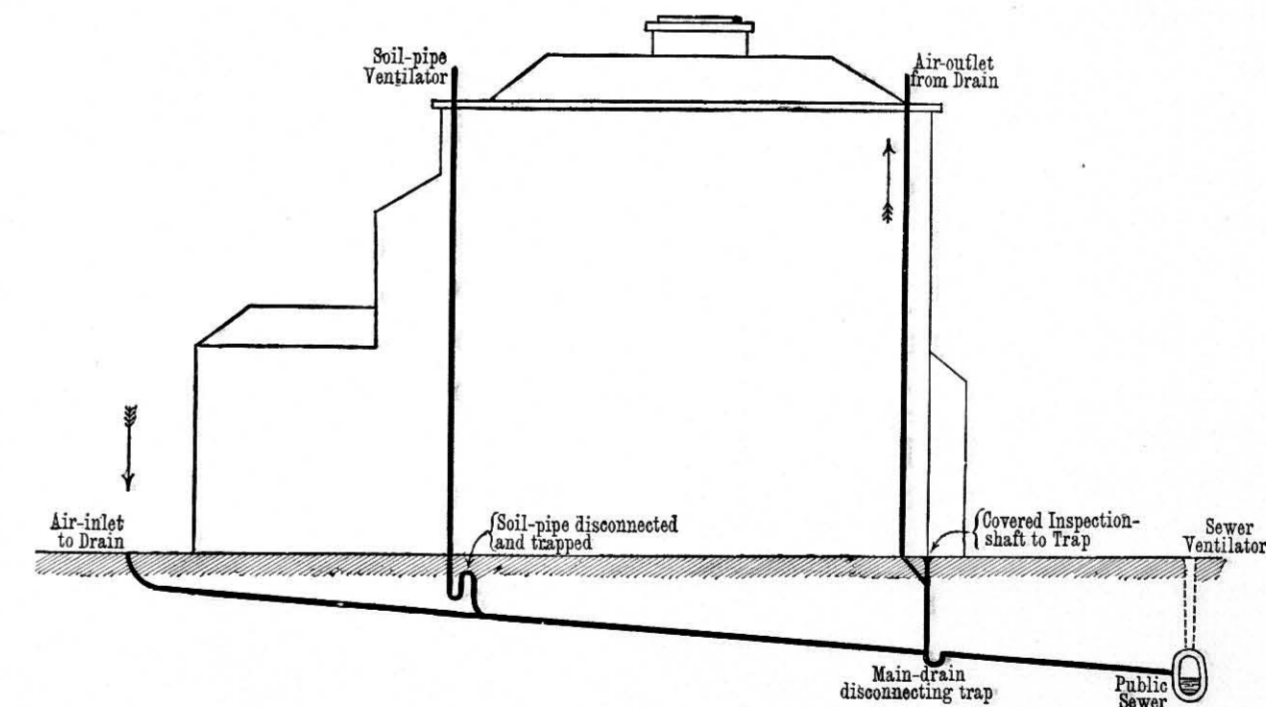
Section showing Drain-ventilation with Inlet at Head of Drain.
